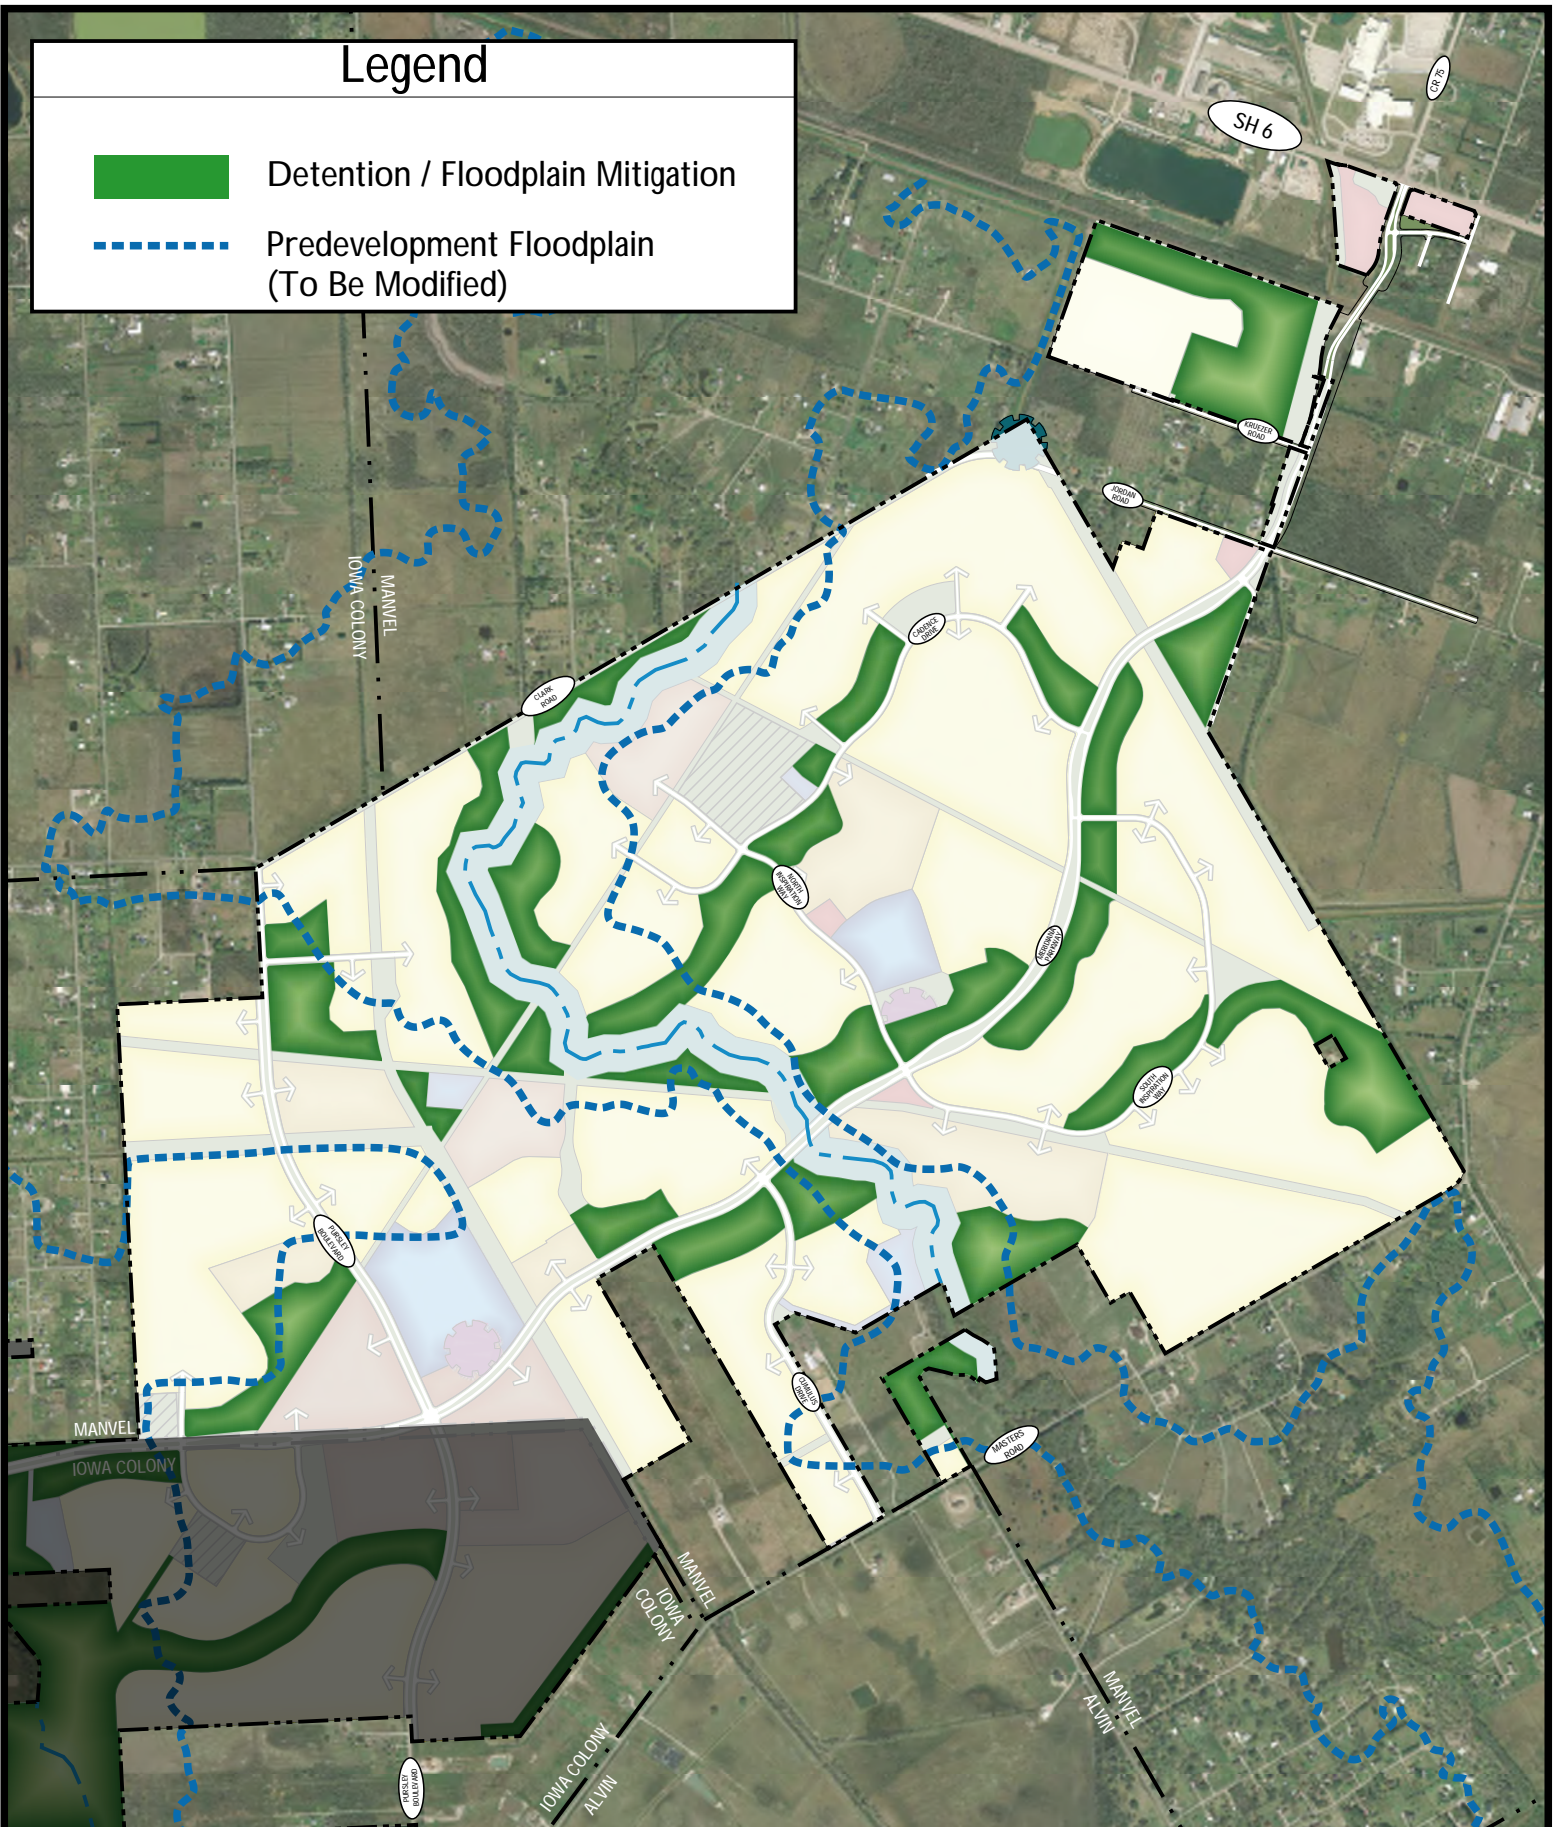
Detention & Floodplain Mitigation Plan - Manvel
